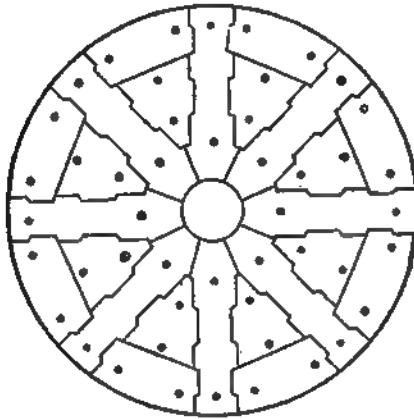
Plan showing bond of stone and fastenings above the solid foundation courses.
